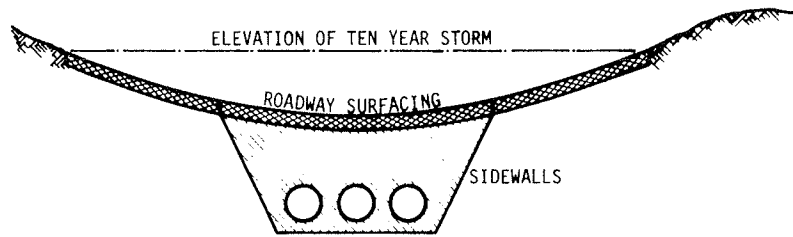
Minimum limits of LWSC roadway surfacing.
